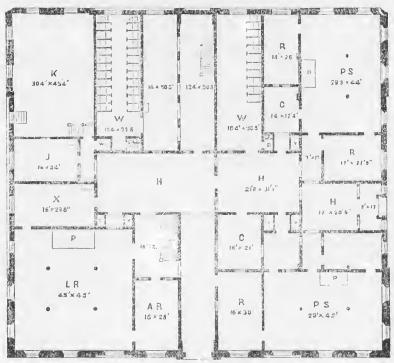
PLAN OF BASEMENT OF DESIGN NO. 61.
